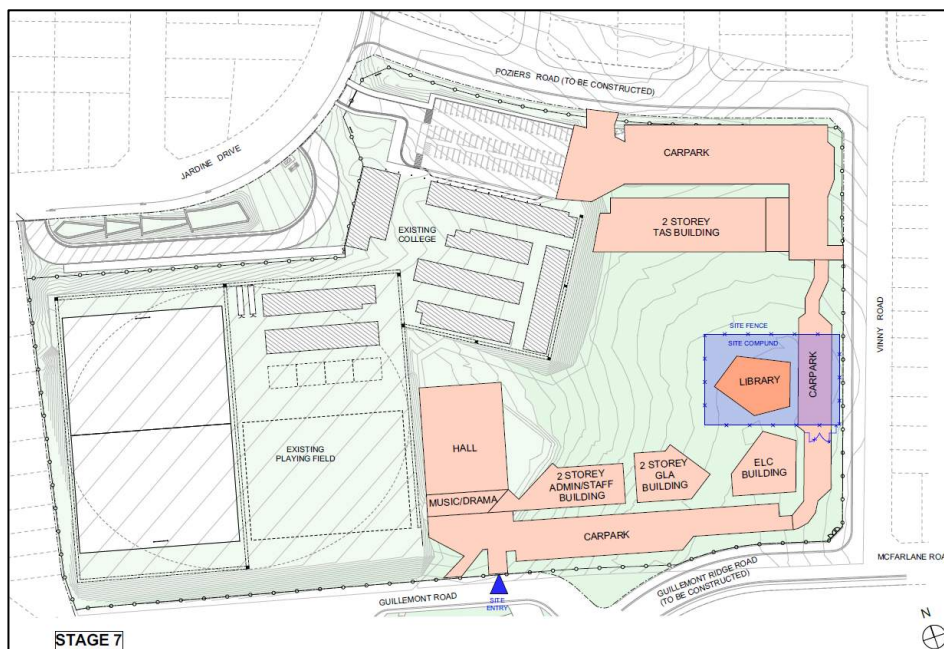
SFCC Masterplan - Stage 7 (Source: JDH Architects)
